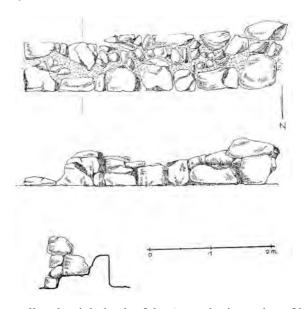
The wall at the right bank of the Artanula river, plan of lower structure exterior masonry (drawing G. Kipiani and M. Akhalaia, 2014).
